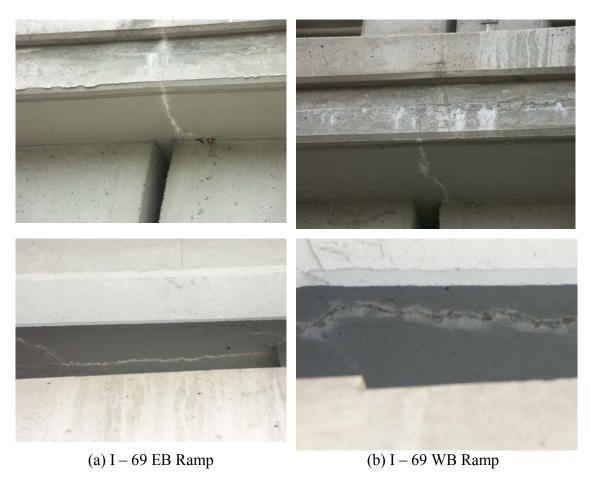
Link slab condition (a) I-69 EB ramp and (b) I-69 WB ramp
